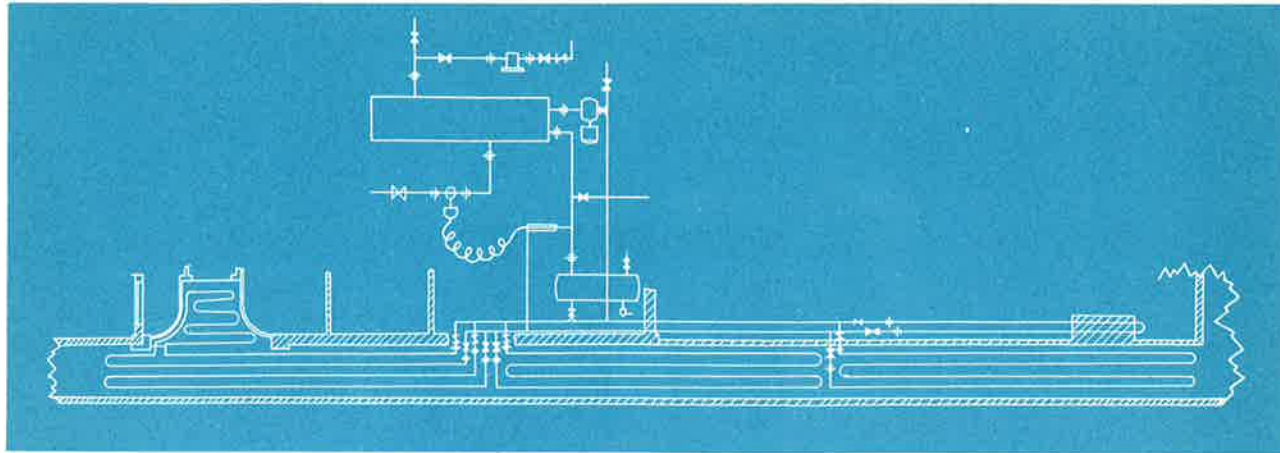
Pipe layout and schematic drawing of heating equipment for the installation at Dewey and Almy Chemical Company, Cambridge, Mass.
